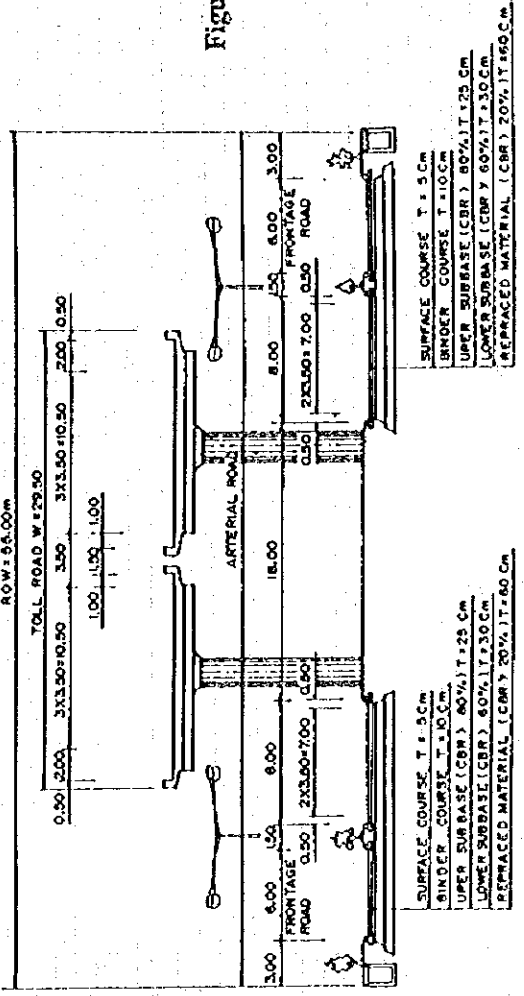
Typical Cross Section for Route-1 (2/2)
